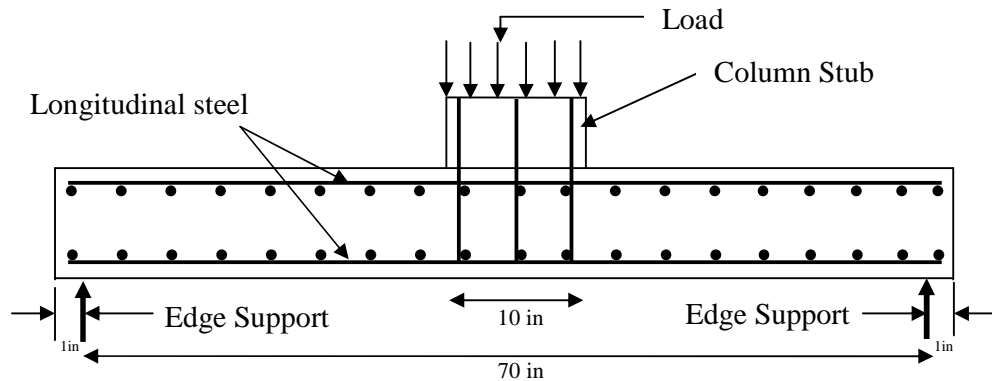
A test slab section of Elstner and Hognestad (1956)
